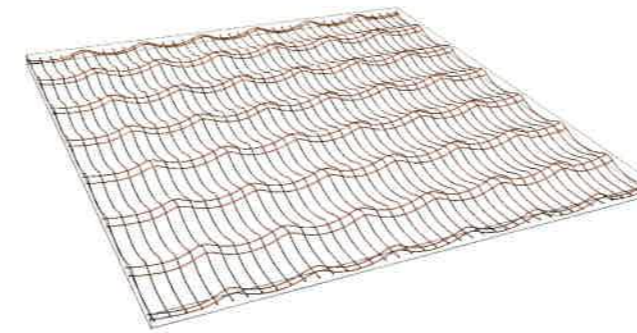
B-2 View of Tendon Layout in Slab (P211)
